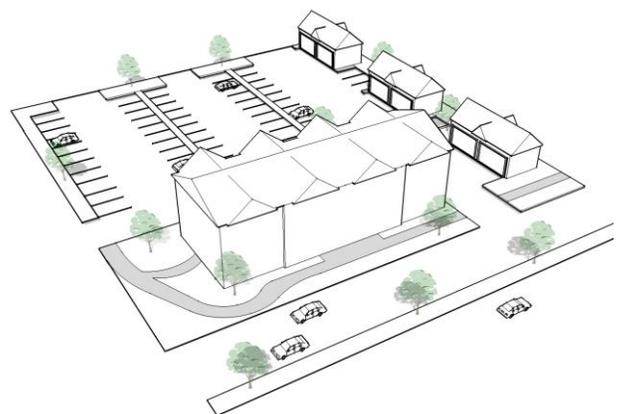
D.7.a: Detached Garage Placement. Detached garages are located perpendicular to the street.
